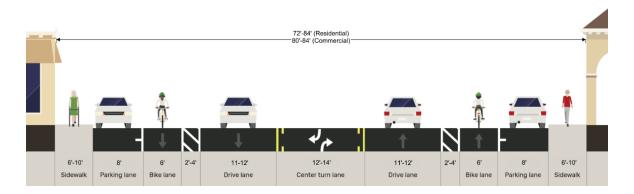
Existing Typical Section for Primary Arterial (Residential Street)
